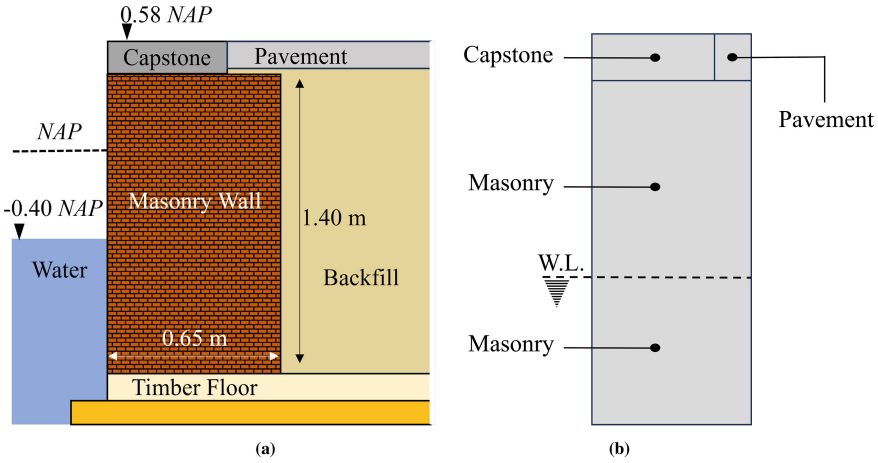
General view of the quay wall section (a), masonry wall schematization (b) (adapted from [11]).
